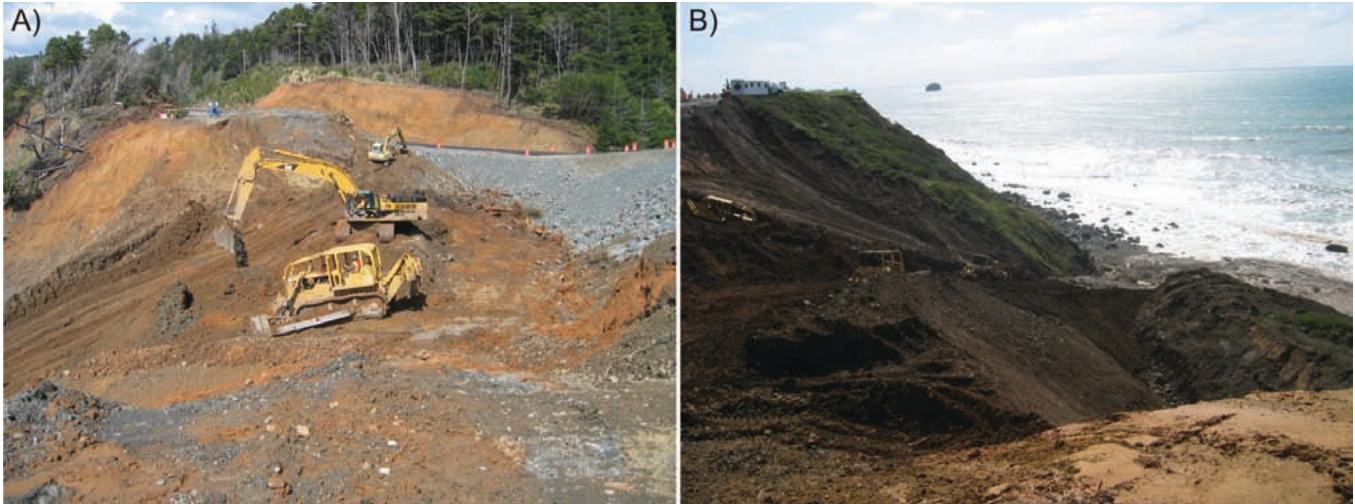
A) Excavation work began at Rocky Creek by removing the portion of U.S. Highway 101 that failed (road in the top right-hand section of the photo reflects the constructed detour used to circumnavigate the work site); B) Removed fill material were bulldozed seaward out onto the beach.
